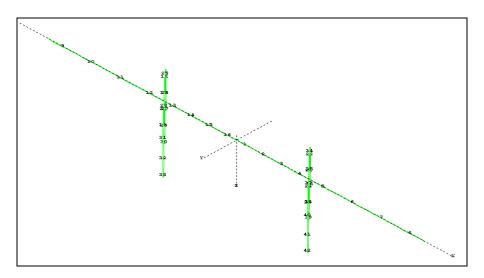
5/649 Bridge Spine Model with Skew
